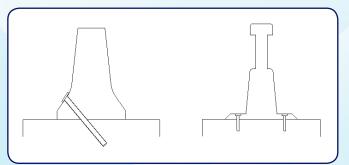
Examples of ground anchorage for temporary precast concrete safety barrier (left) and steel safety barriers (right).
